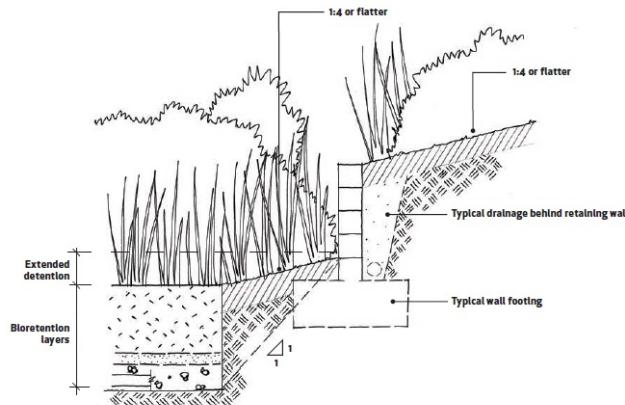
Typical Bio-Retention Basin Detail incorporating a Retaining Wall
